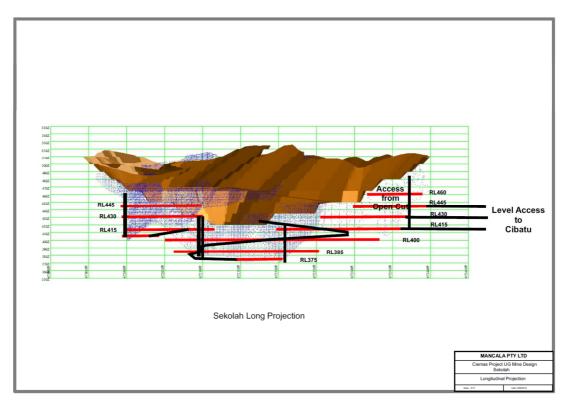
Longitudinal projection of conceptual mine design for Sekolah post open cut mining.
